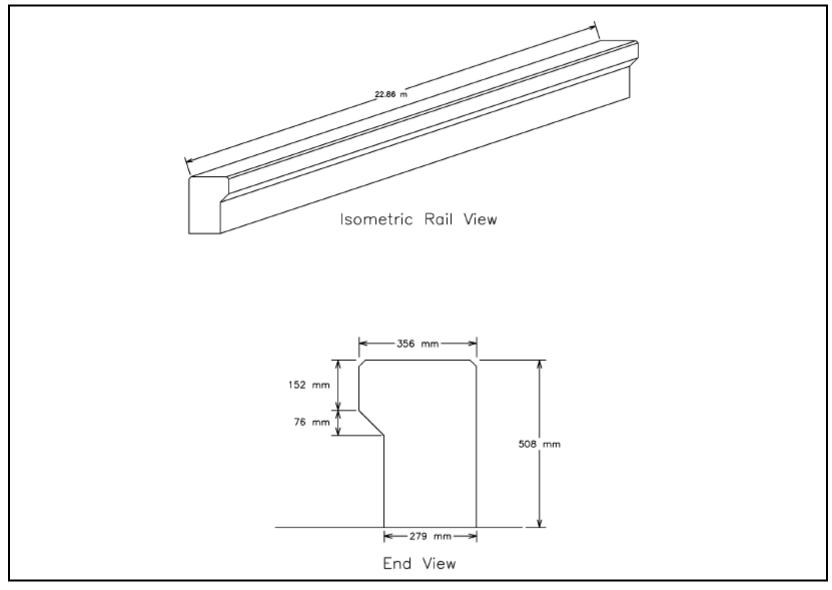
Layout of NDOR Low-Profile Bridge Rail
